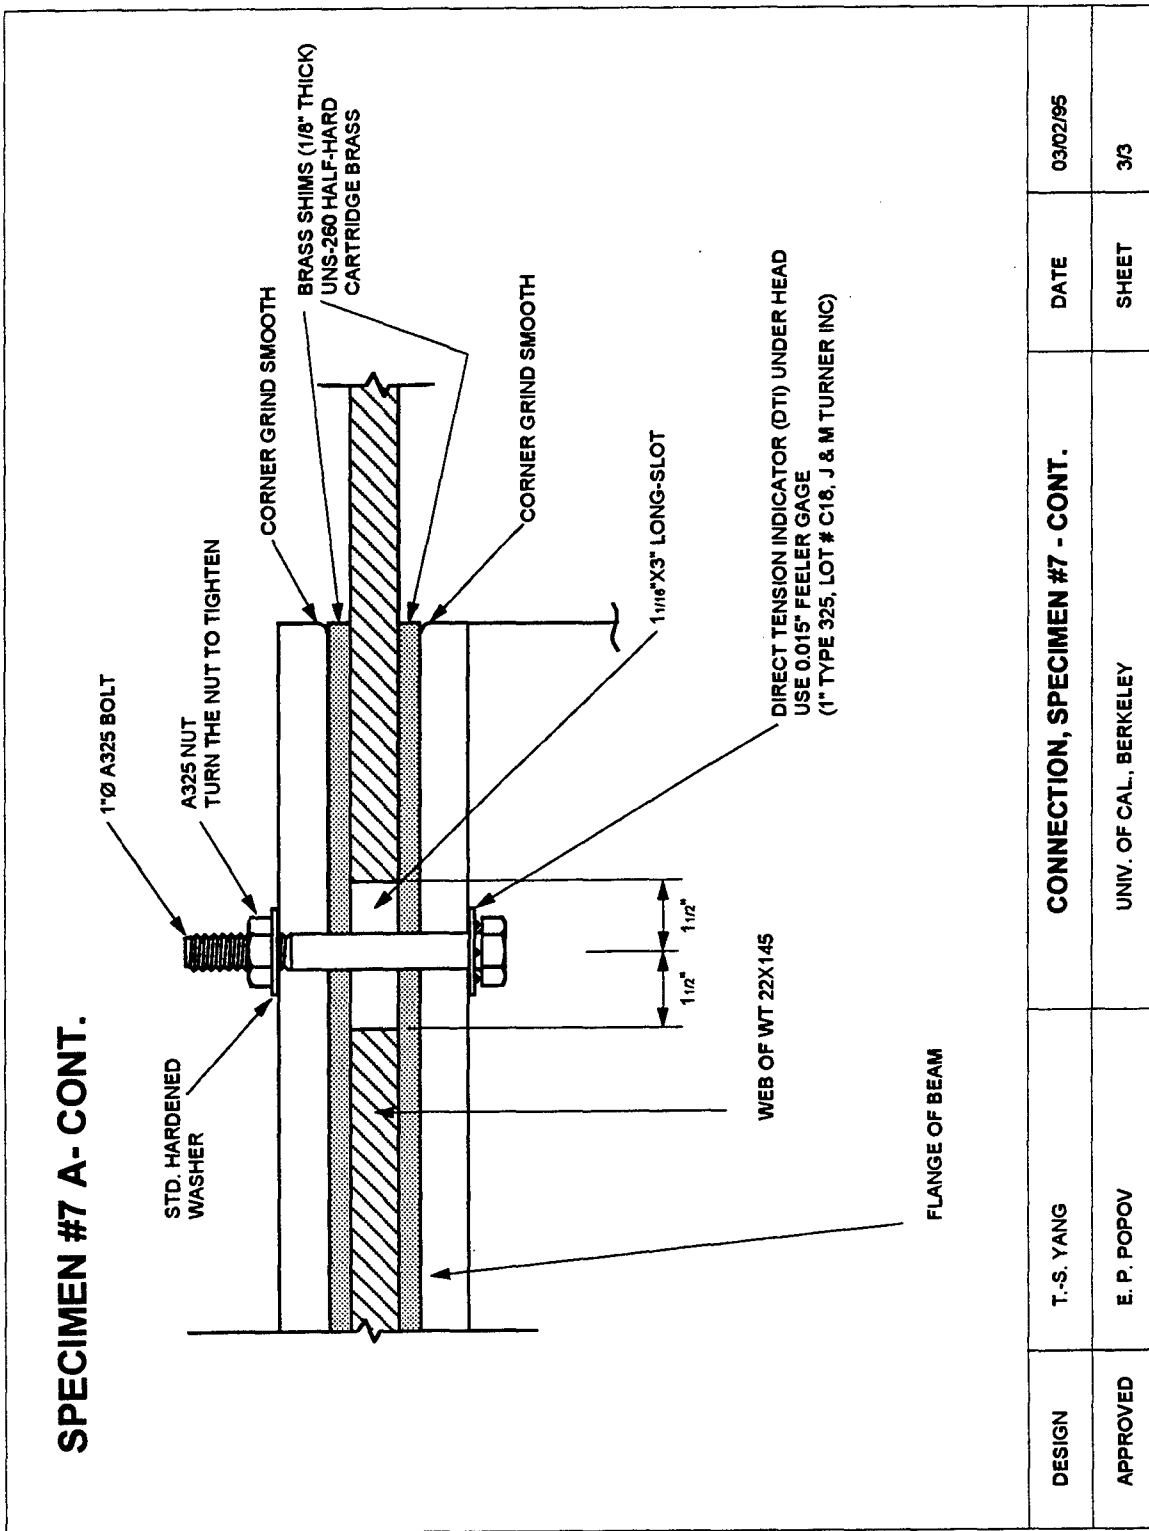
Detail of a rotational friction damper: Specimen 7A (Sheet 3/3).
